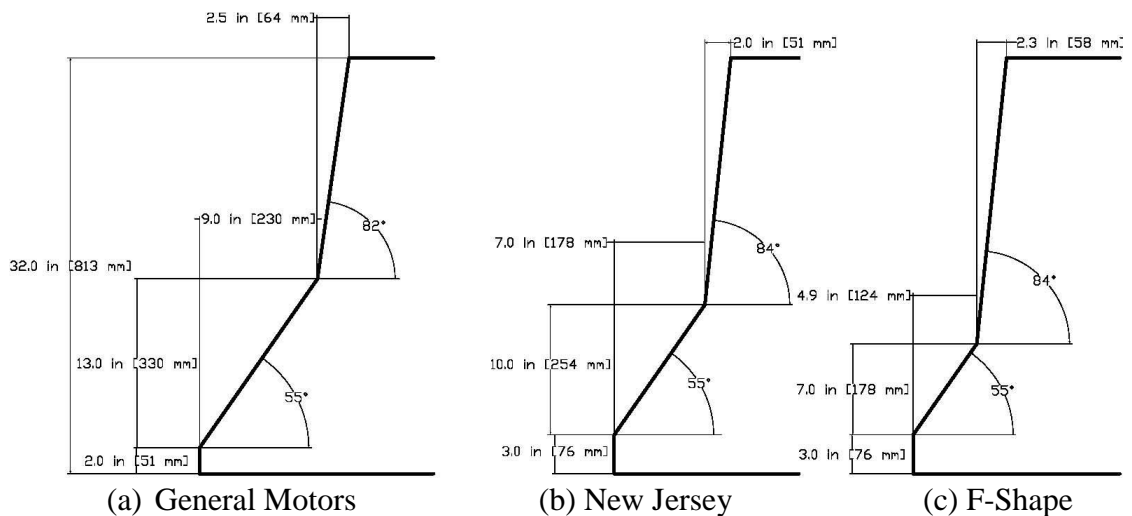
Front-Face Geometries for Safety-Shape Concrete Median Barriers [3-8]
